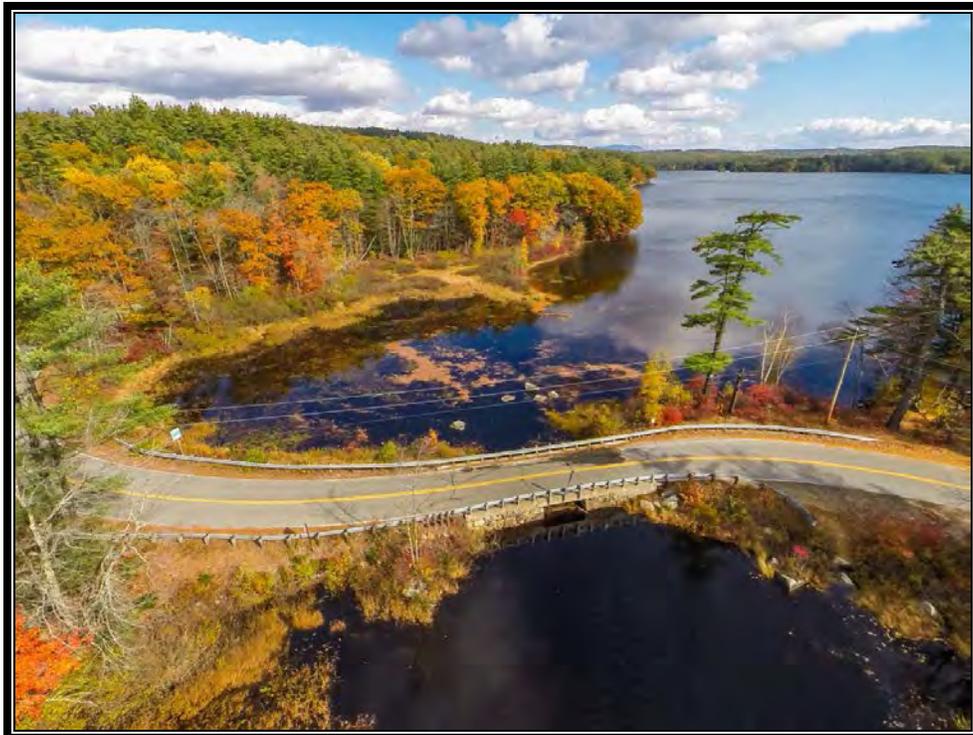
Aerial view looking east at project site (DragonFly Aerials Photo).
